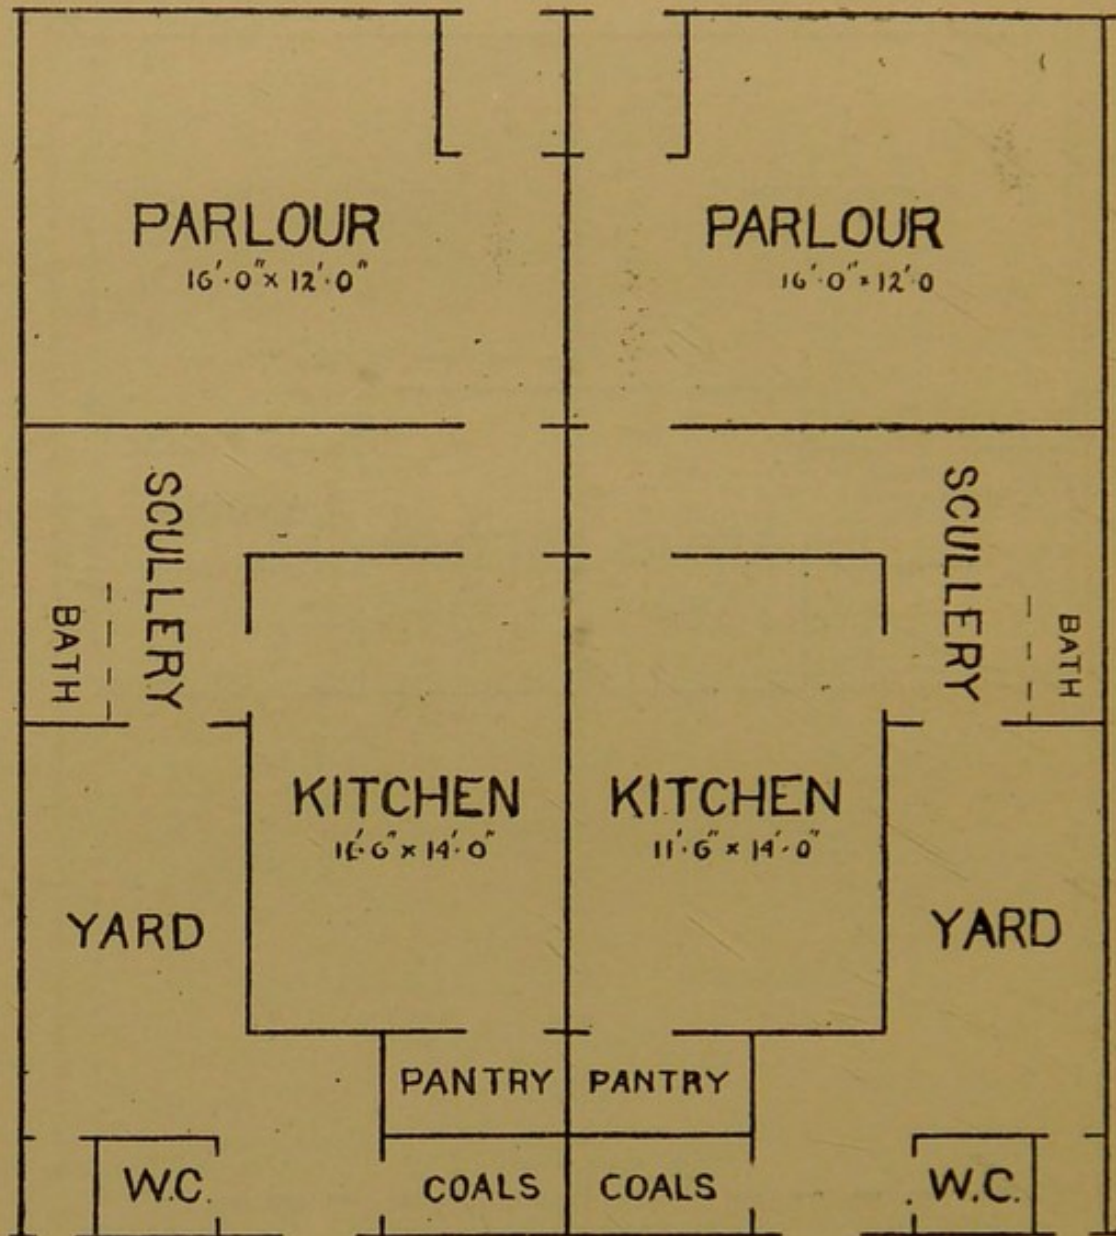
WEST HARTLEPOOL: TYPE B (GROUND FLOOR).
